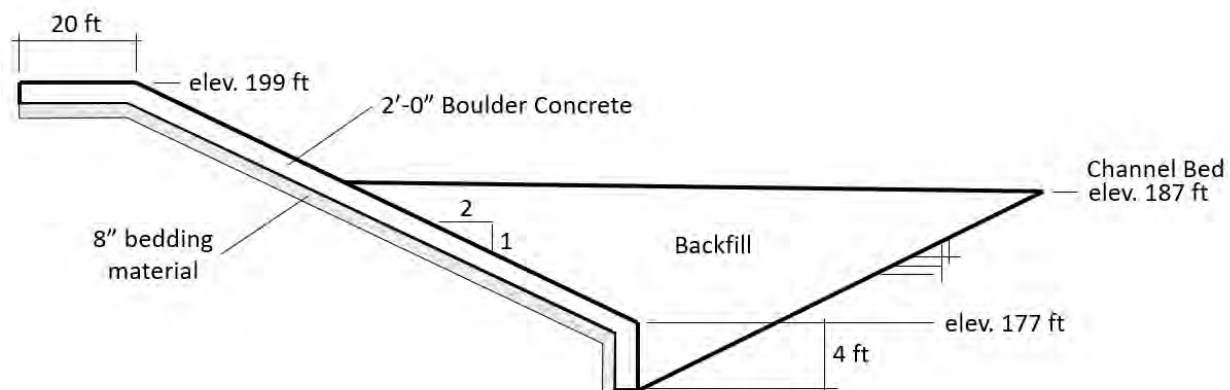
Cross-Section View of Proposed Pre-Formed Scour Hole Concept
